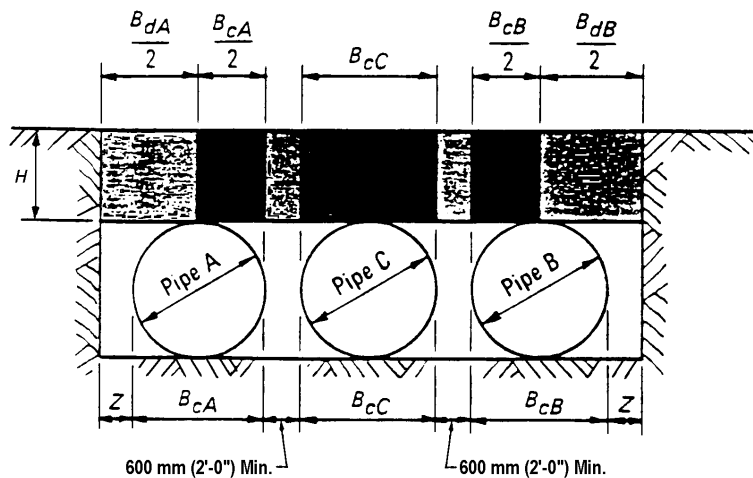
Flat Trench Multiple Pipe Installation
